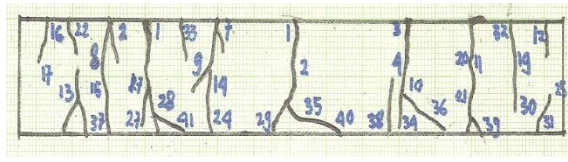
Crack at middle span of beam specimens at ultimate stage (Susilorini, 2009b)
